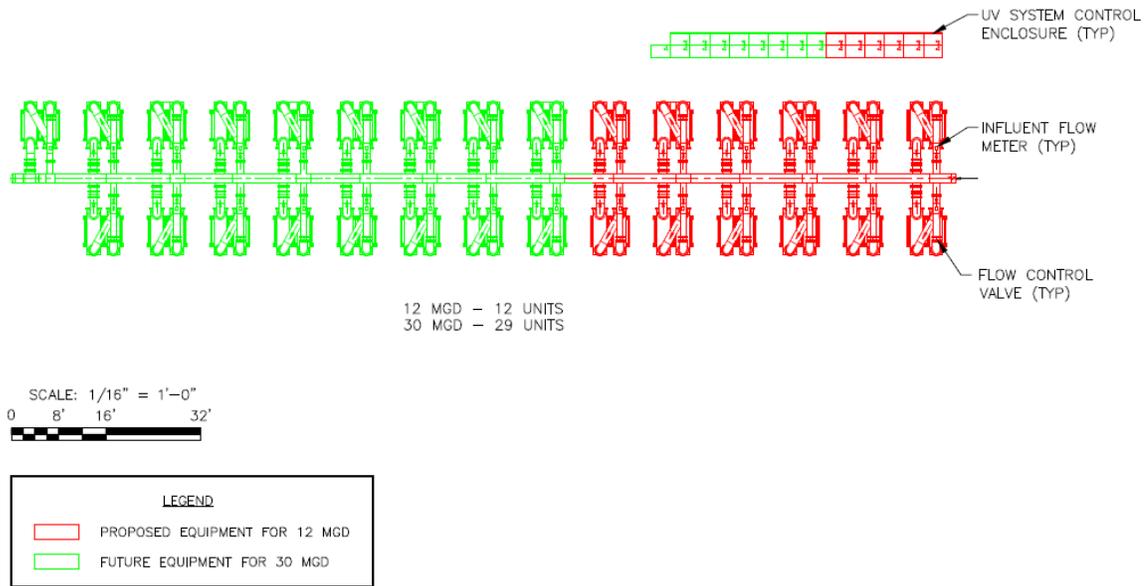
Plan C UV Disinfection System Preliminary Layout
